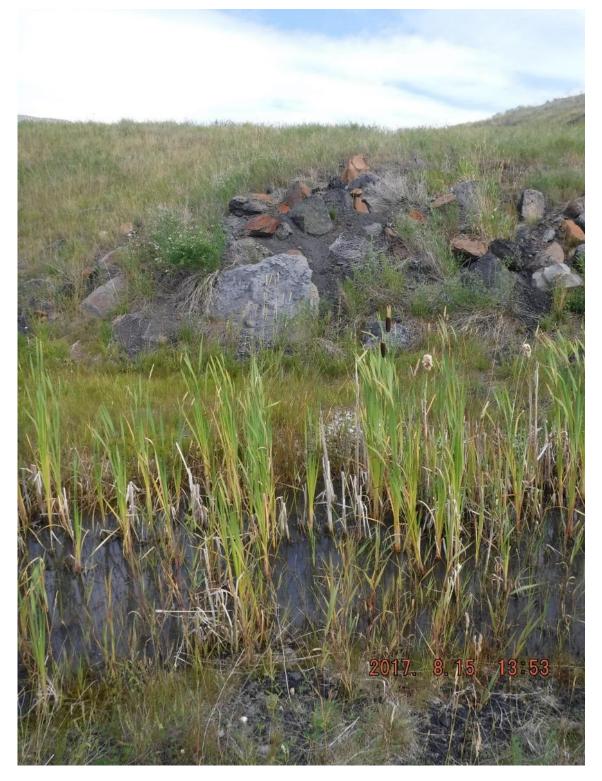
From dam crest looking northwest at the spillway low flow channel and downstream slope – no obstruction or sign of distress (PTD-2017-42)
